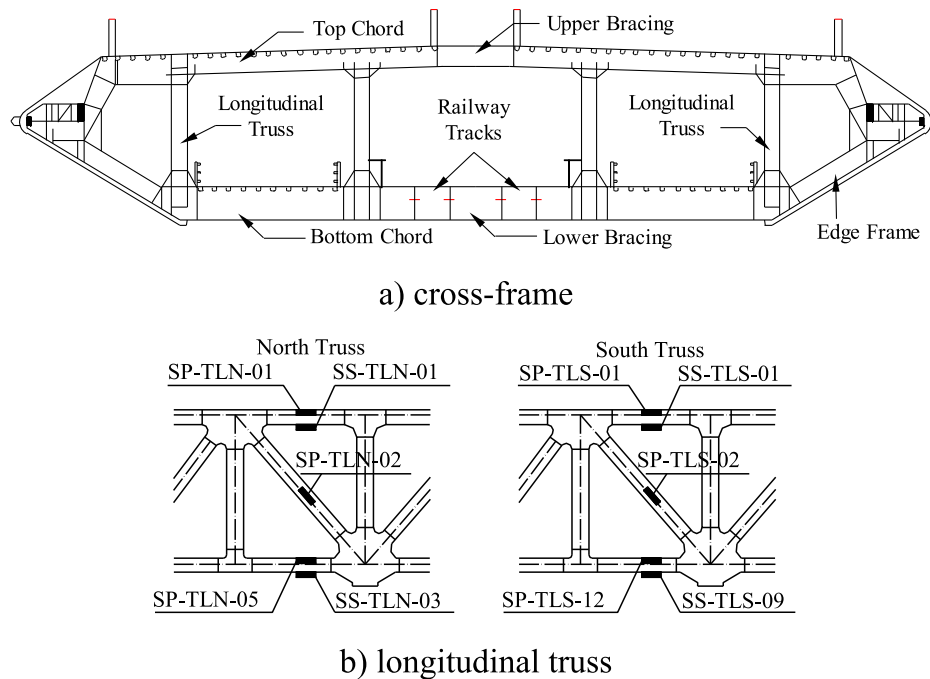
Deck cross-frame and longitudinal truss of TMB.
